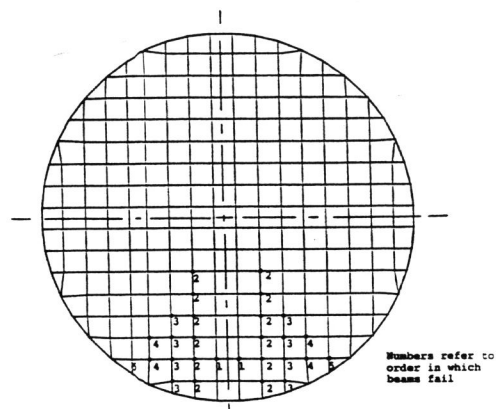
The Order of Beam Failures Assuming All Beams Contain a Type 2 Crack 3.79 Inches Long
